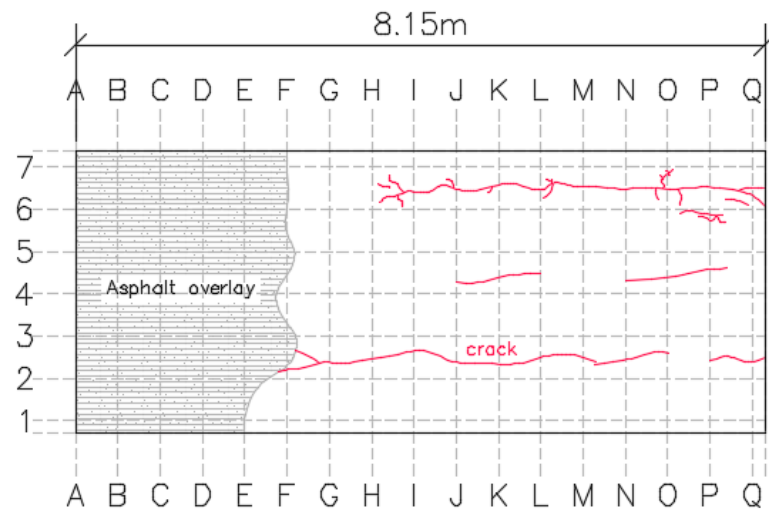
Damage location based on visual inspection on span no. 1
